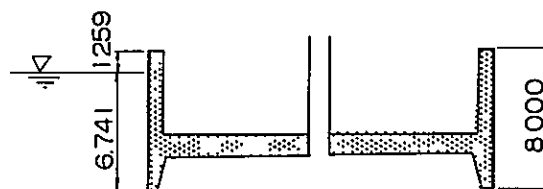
(3) FLOATING CAISSON METHOD
